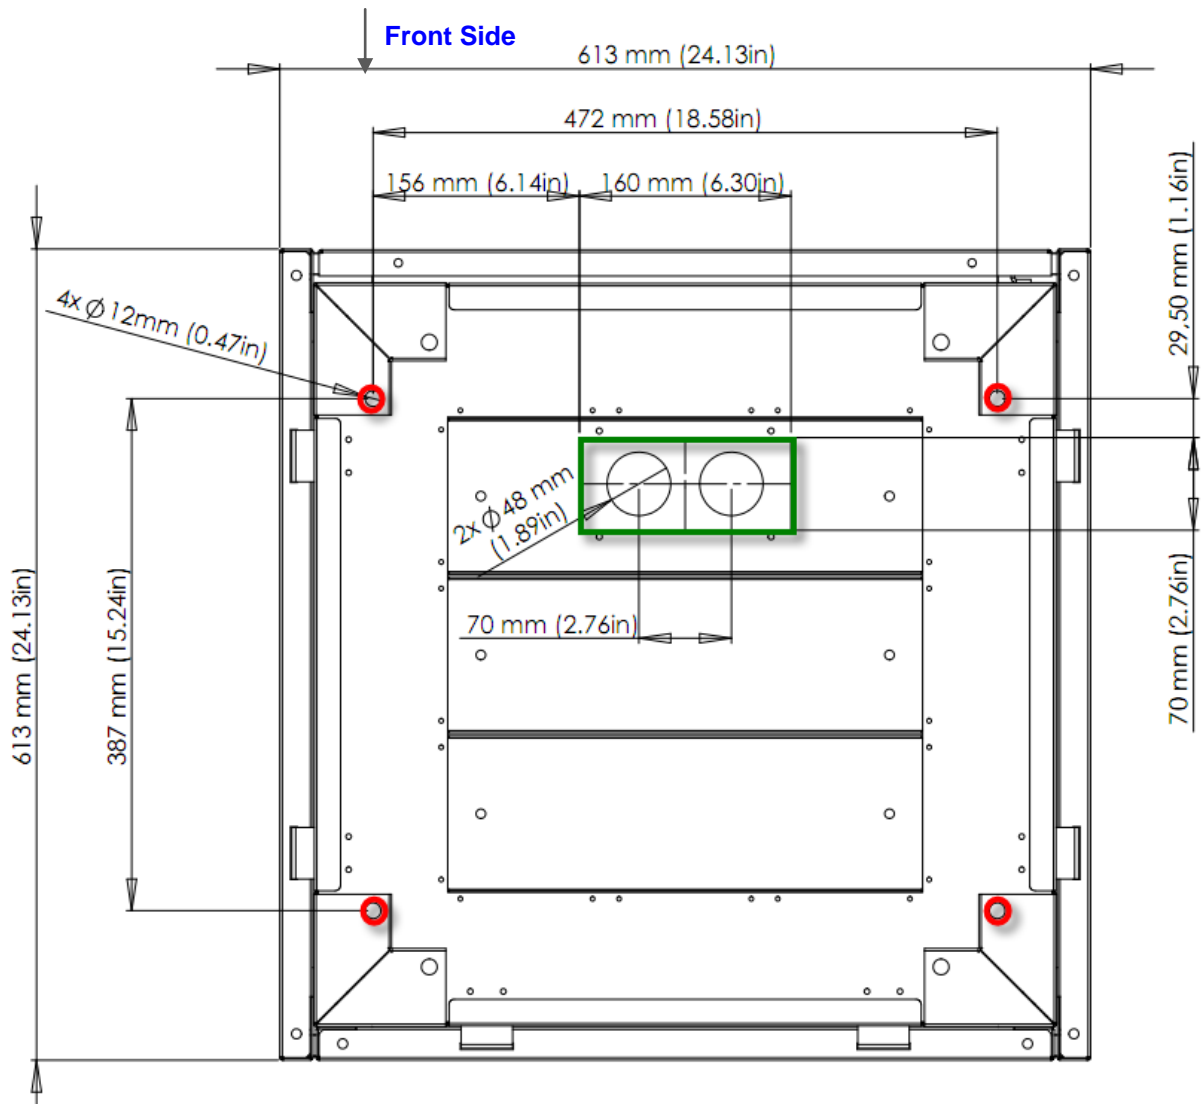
EFAPOWER EV-QC45 Drilling and conduits layout
